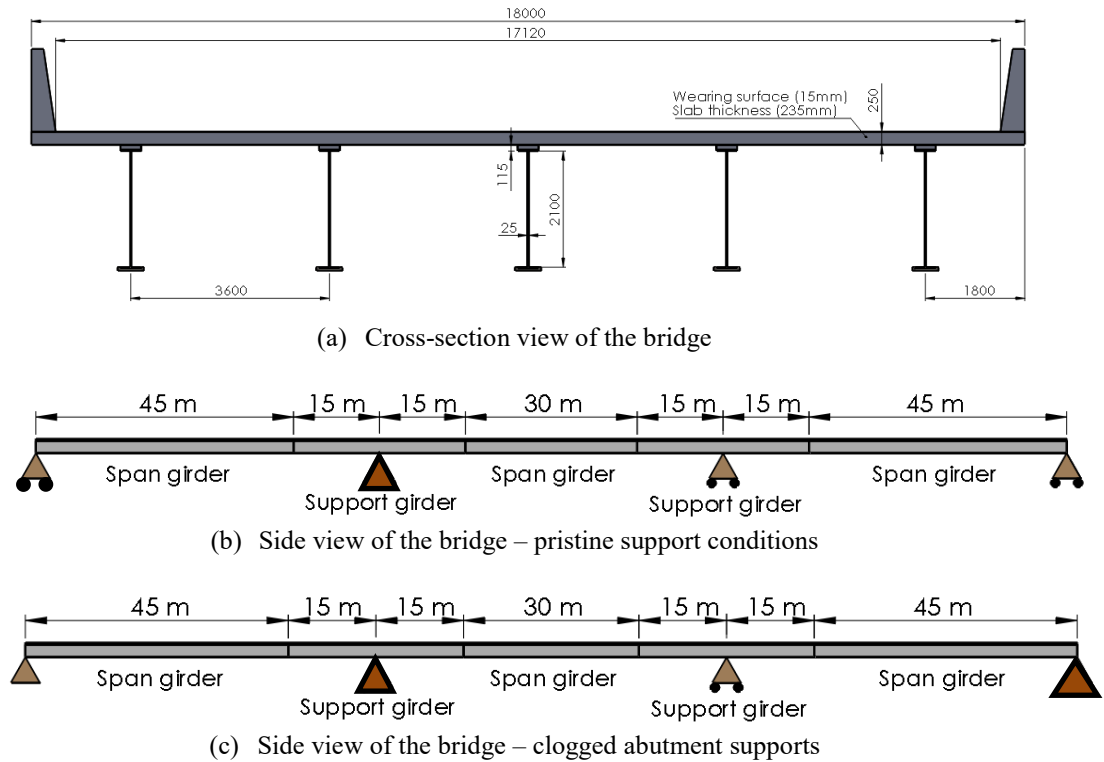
Concrete Slab on I-girder Bridge Analyzed.
